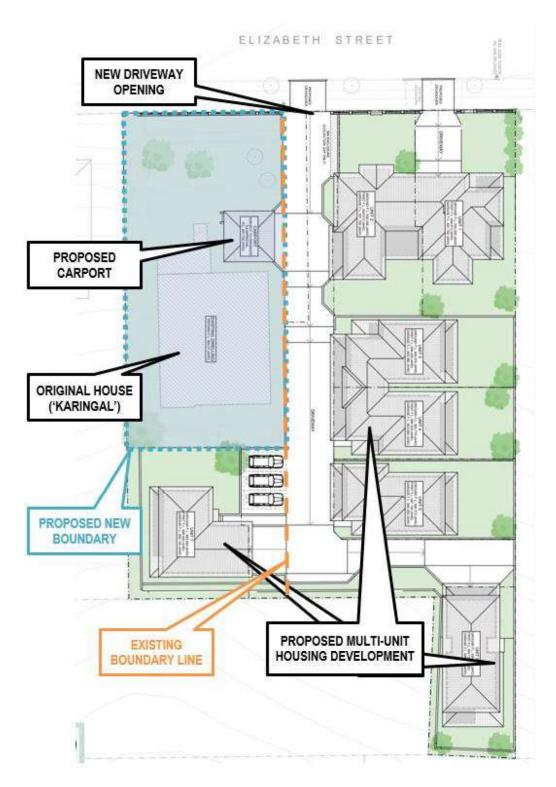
Proposed subdivision and development of 26 Elizabeth Street via DA 22/0513 and DA 22/0535 (from plans provided as part of DA 22/0535 with added annotations).
